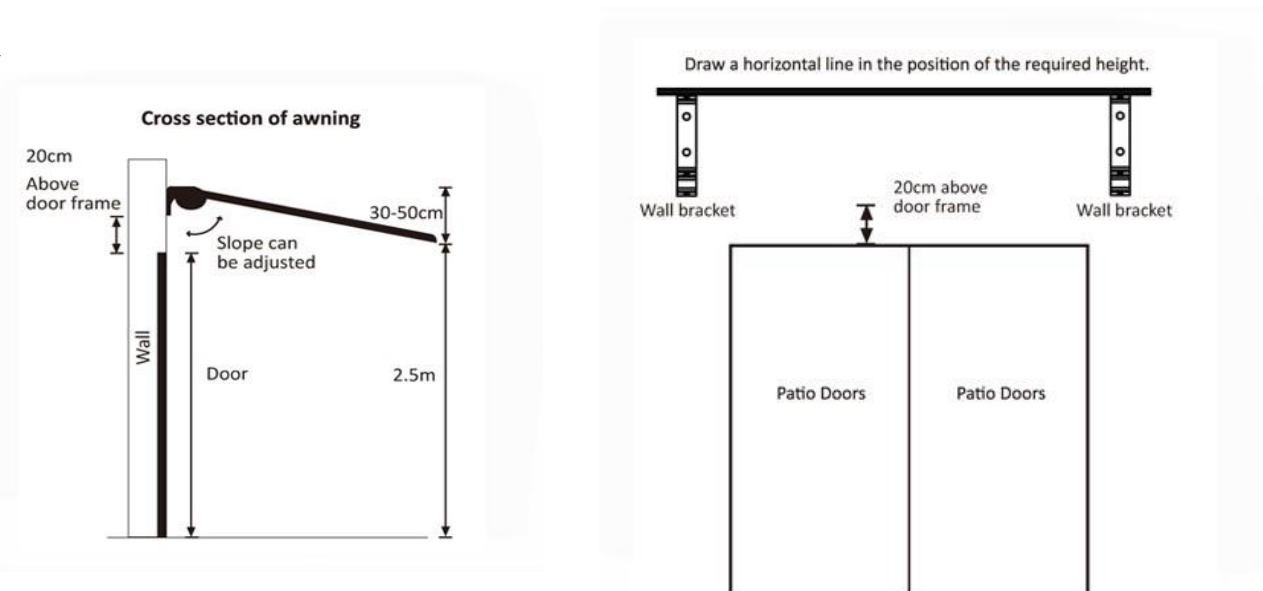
Open packaging, remove the Wall bracket (B), and Anchor bolt (CC), to install on wall or ceiling. There are signs on the back of awning, which can help you locate.Place Anchors bolt (CC) into the holes, install the wall bracket and keep all brackets level, and tightly fasten screws.
